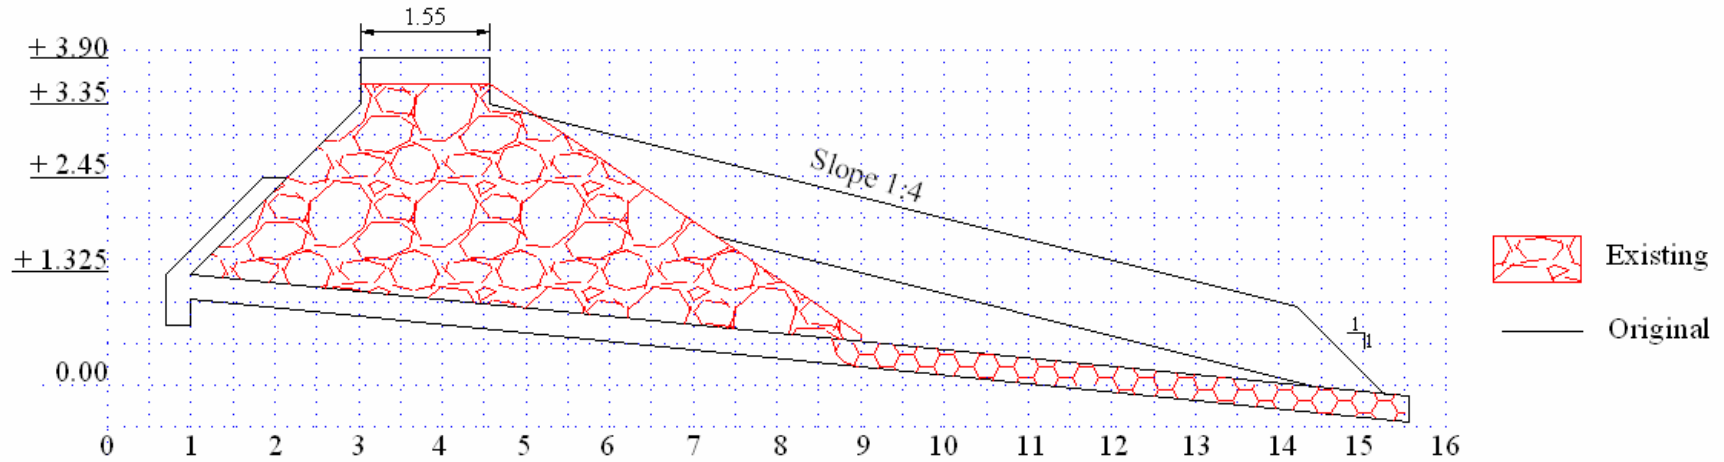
Cross-section of existing seawall at Gunduparambu
